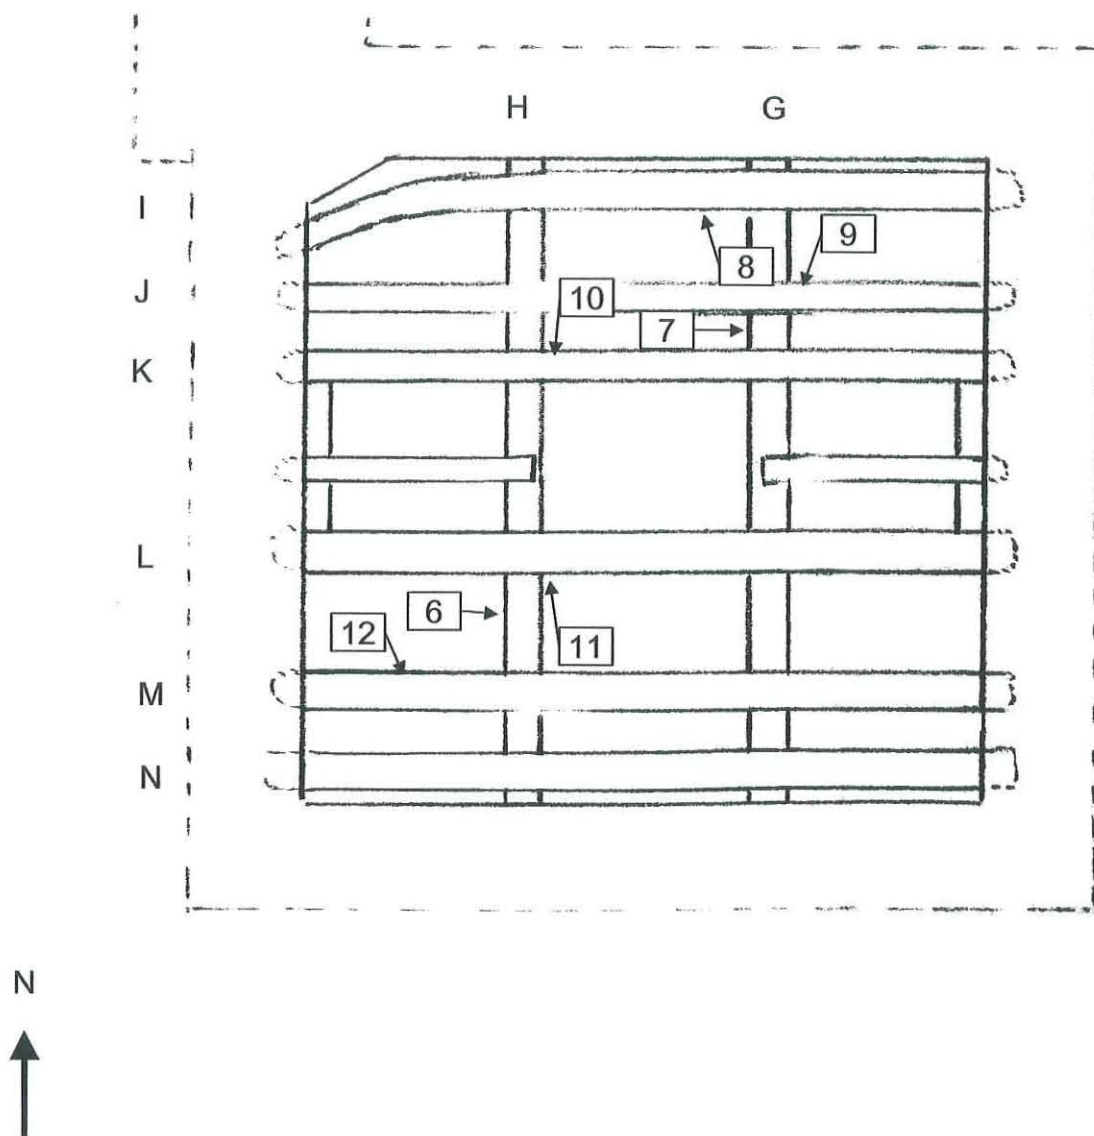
Sketch plan of the floor beams of the clock chamber at Holy Cross church, Crediton, Devon, showing labelling scheme applied. The labelled arrows indicate the sampled timbers visible on this plan
